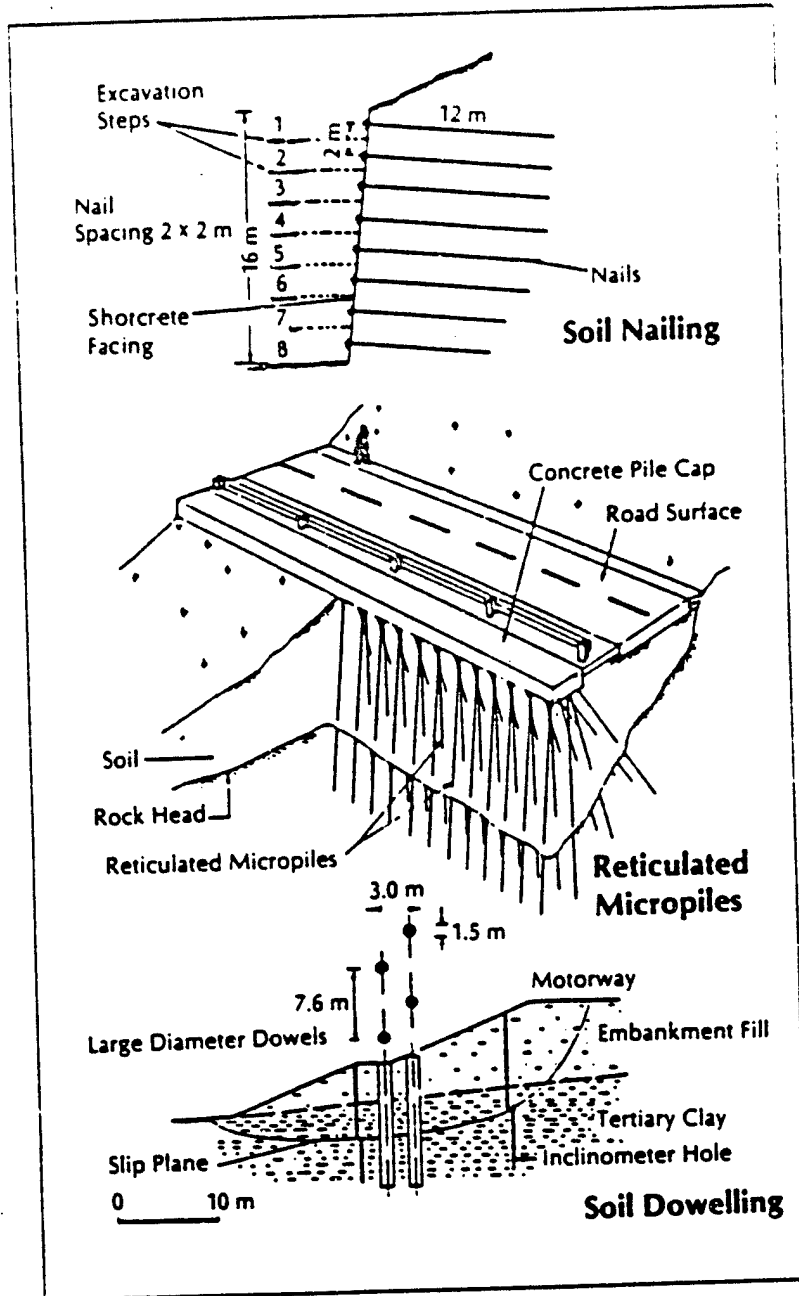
The family of in situ soil reinforcement techniques (Bruce and Jewell, 1986).
